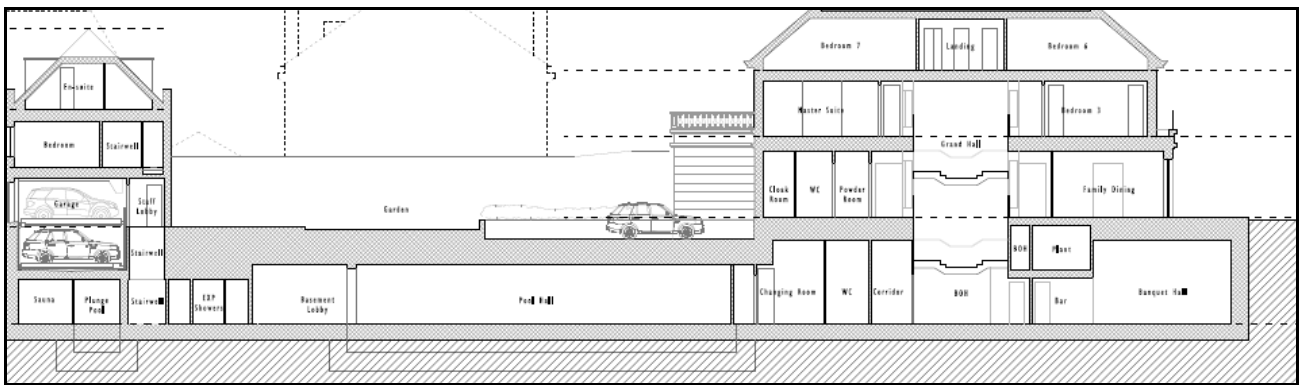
Section through proposed site (Source: taken from Drawing Number 1422-PL-321)
